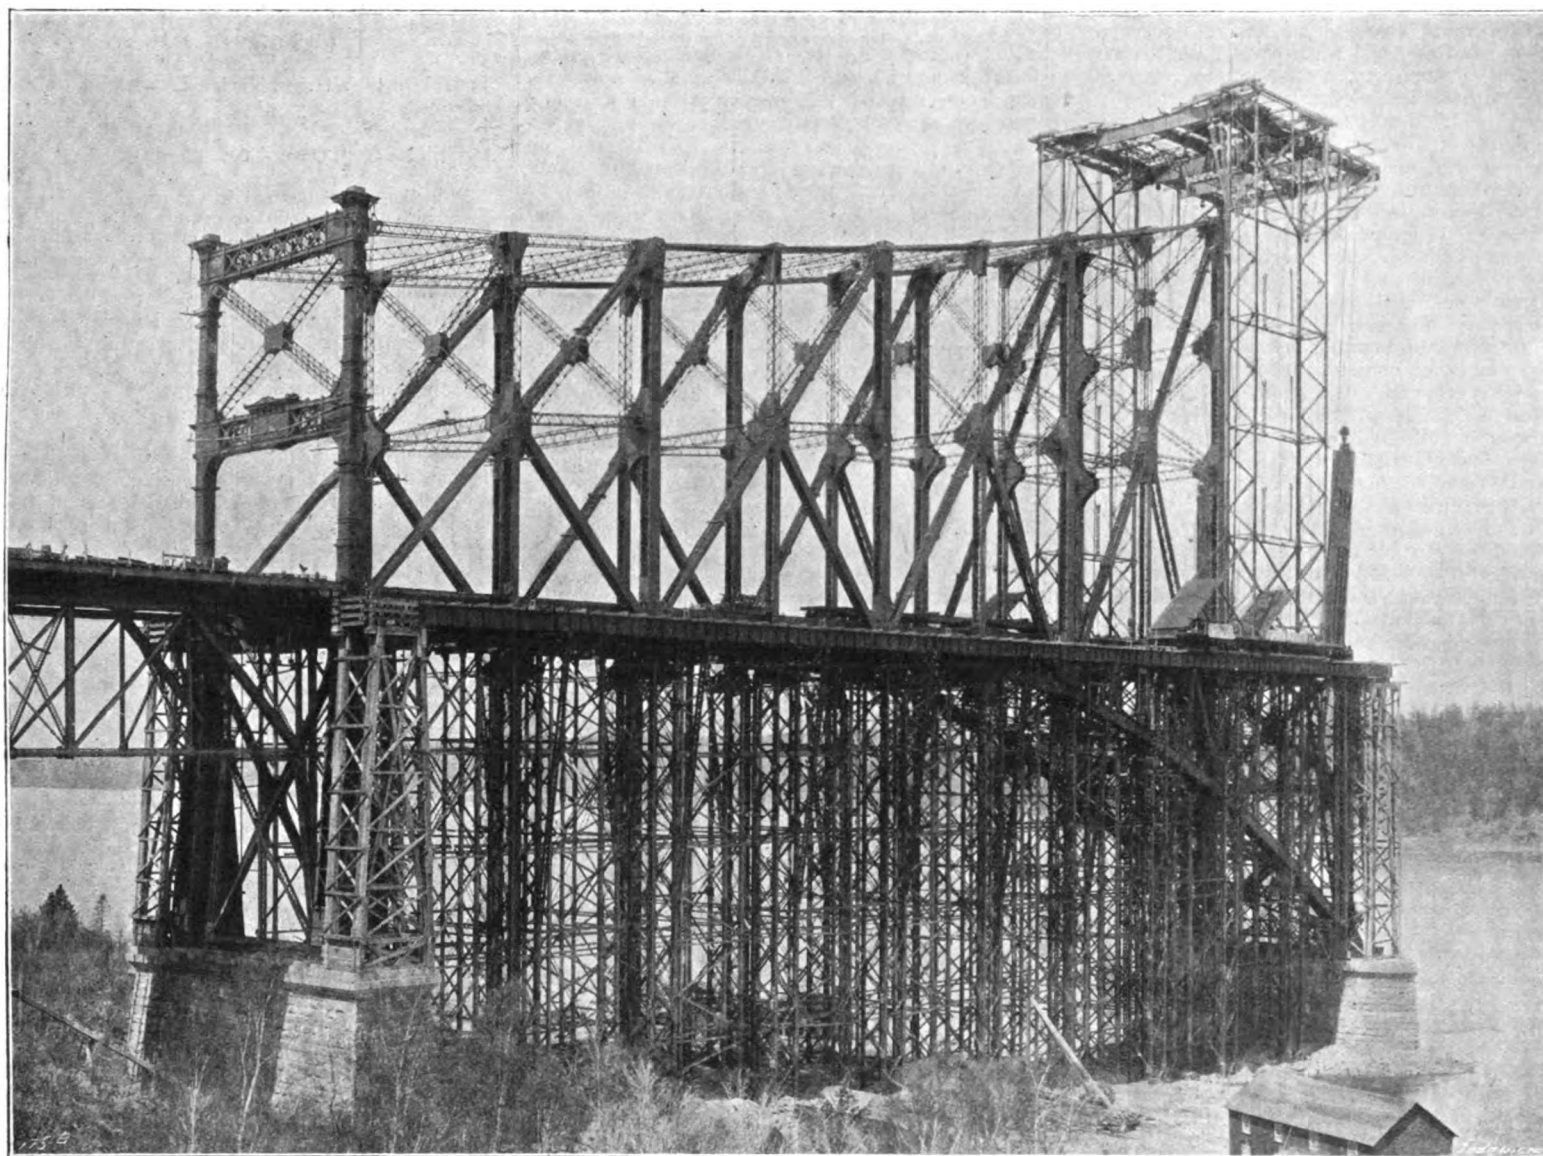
LAST PANEL OF SOUTH ANCHOR-ARM.
